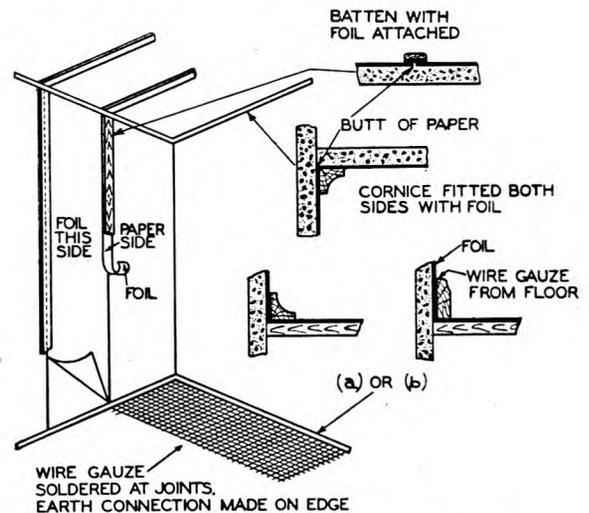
SCREENING FOR WALLS, CEILINGS AND FLOORS.
